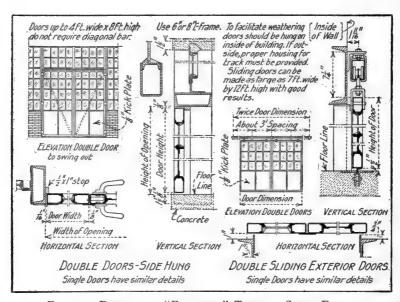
Details of "Fenestra" Tubular Steel Doors.
